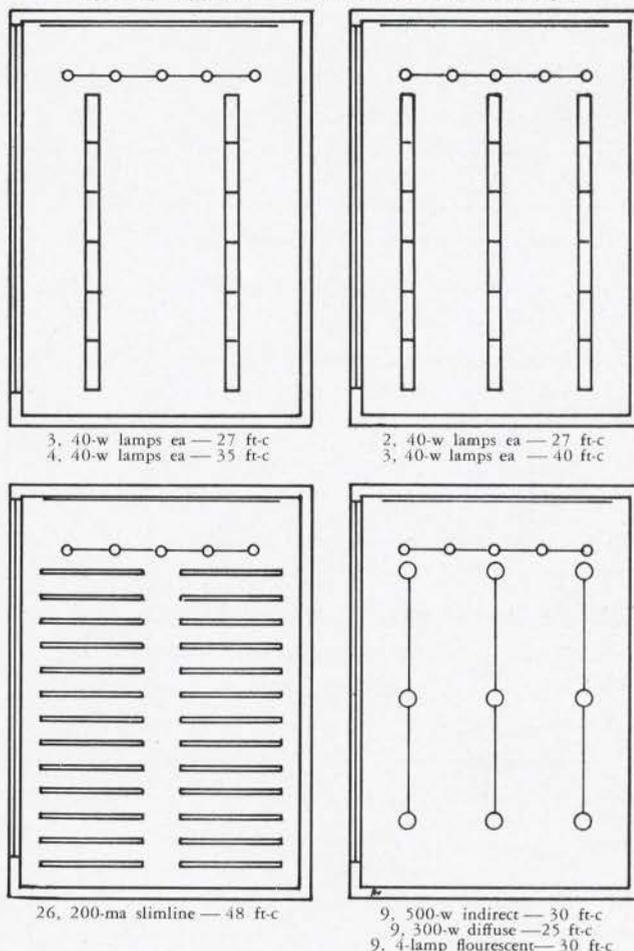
illustrates a few typical luminaire layouts, with details of type and resulting illumination levels noted.
